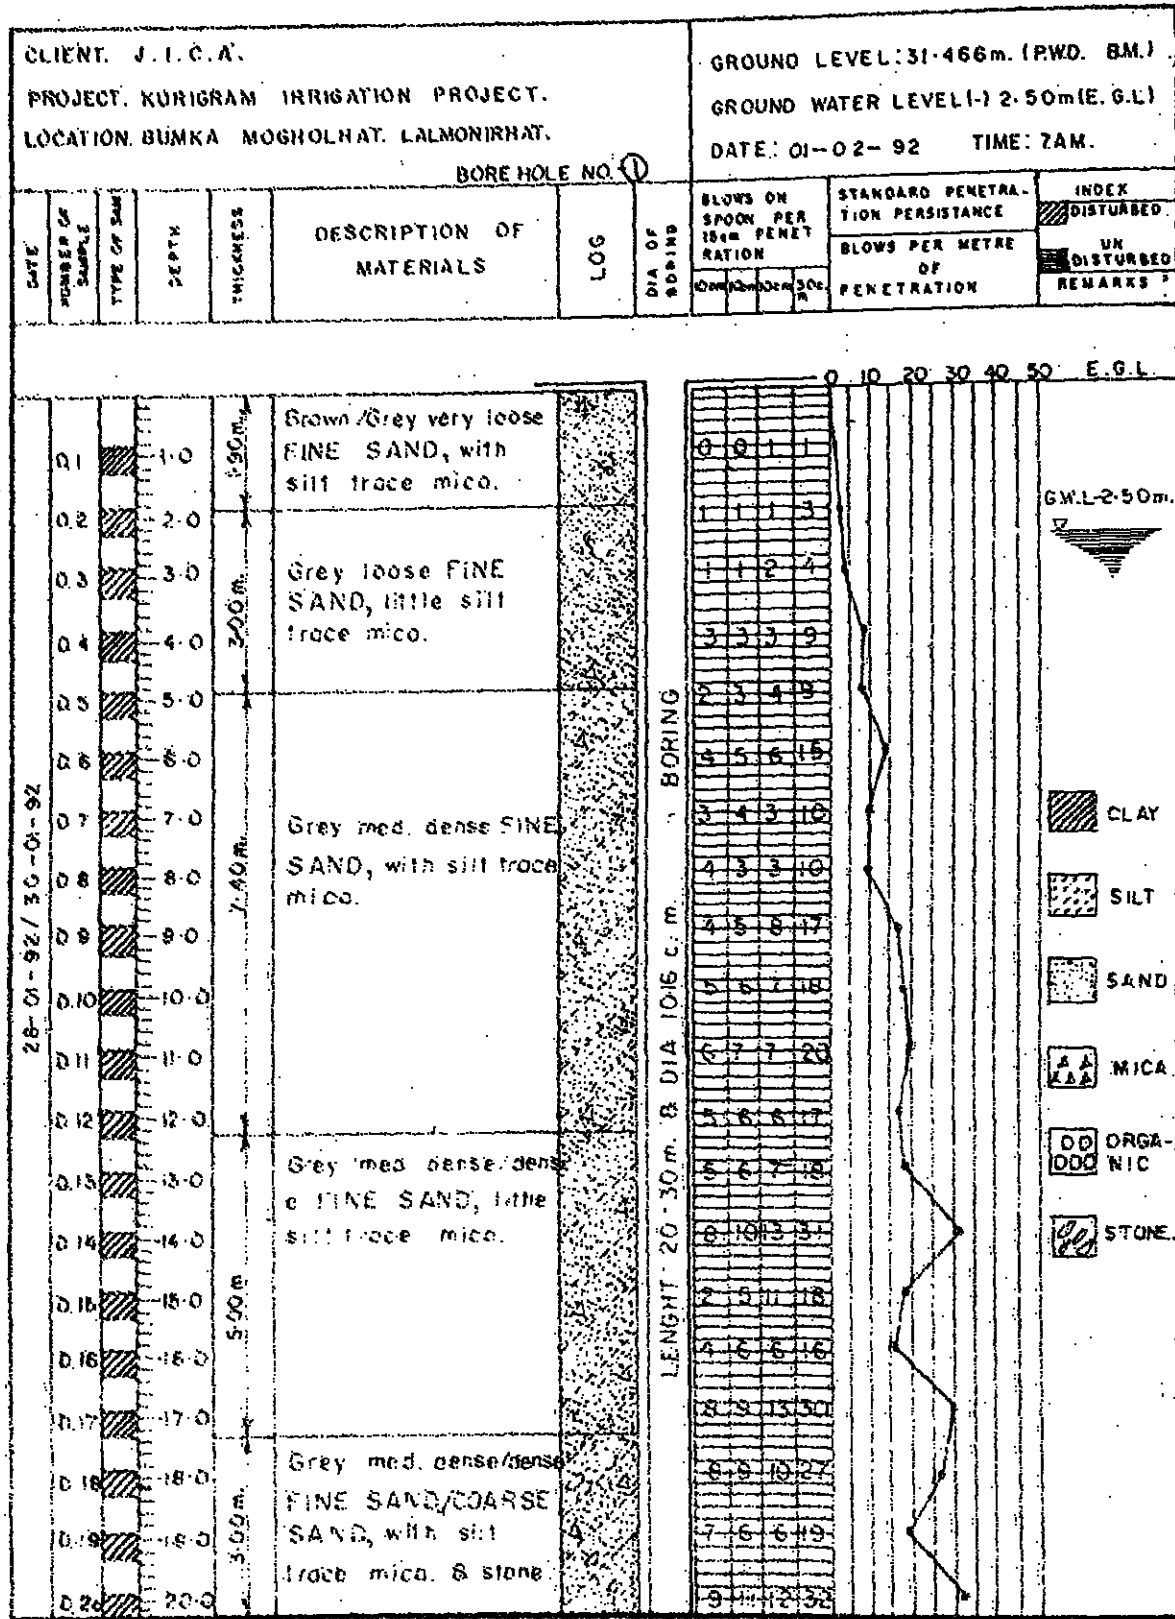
PROPOSED PUMPING STATION SITE (1/8)
